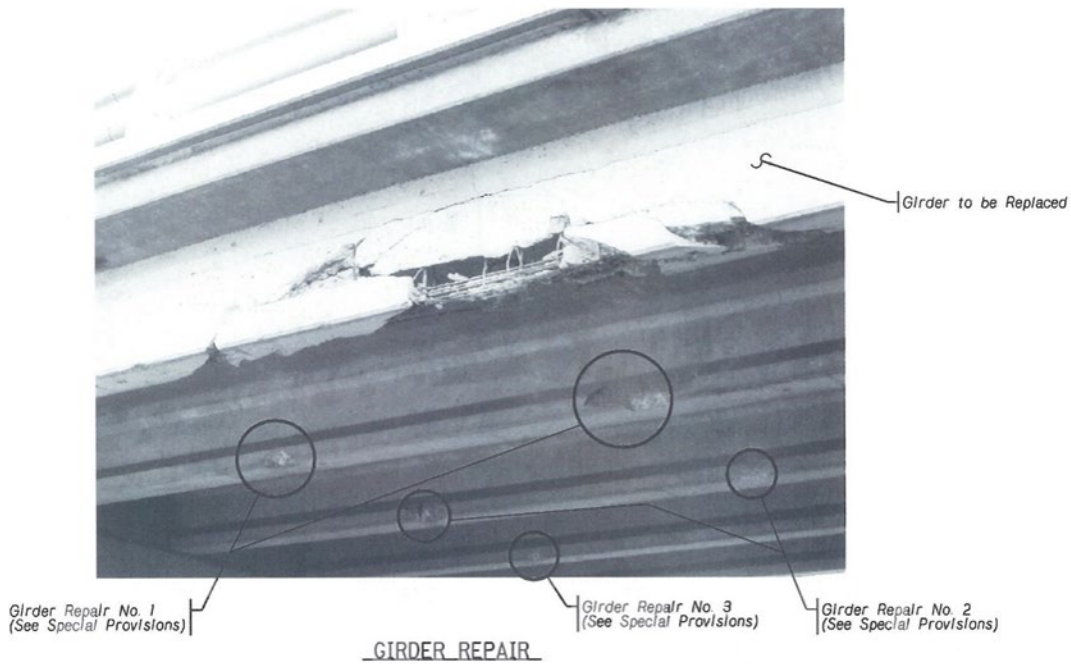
Girders to be repaired or replaced, from the repair documents of I-680 over US-75 Bridge, courtesy of NDOT
